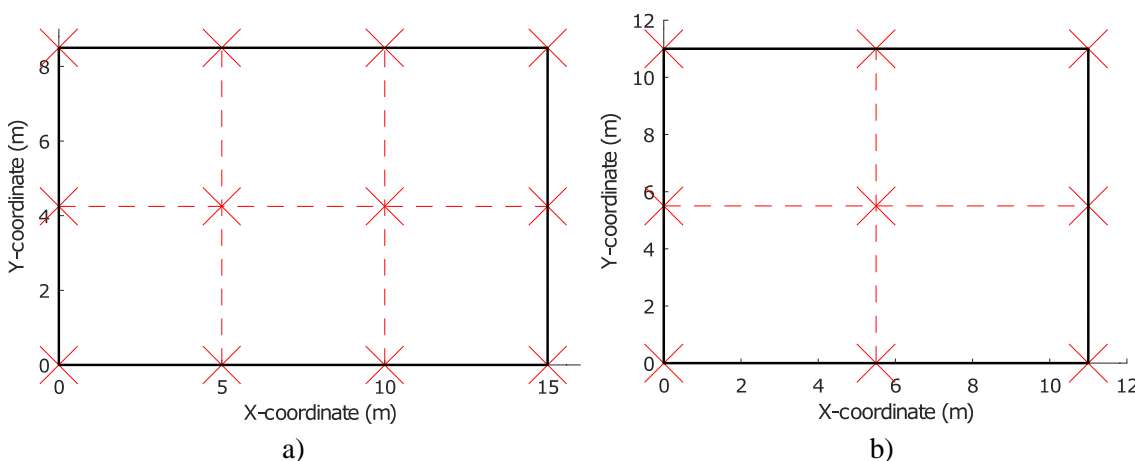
a) Design 1 isolator layout and b) design 2 isolator layout
